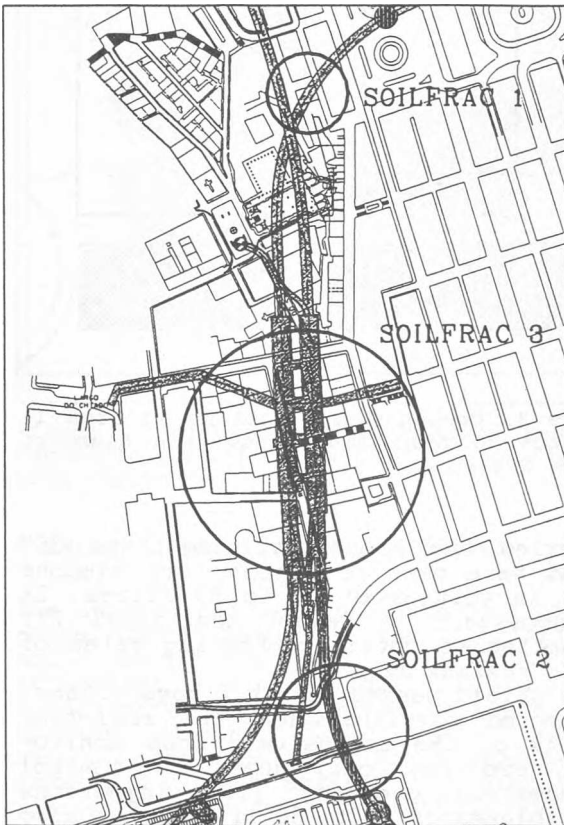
Two new underground stretches will connect three existing railway stations in downtown of Lisbon. Settlements due to the tunnel excavation are not compatible to the structural behaviour of historic buildings in certain areas. Compensation grouting was used to minimise angular distortions in three areas.
